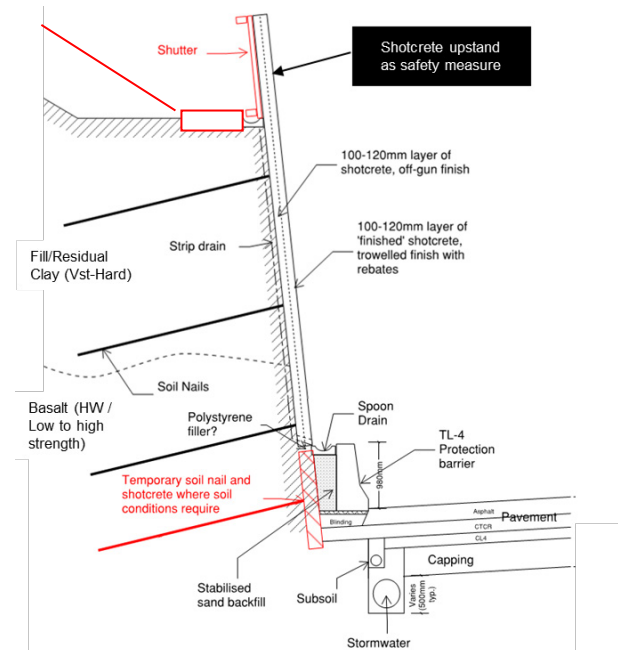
Typical cross-section of soil nail wall featuring barrier and shotcrete upstand
